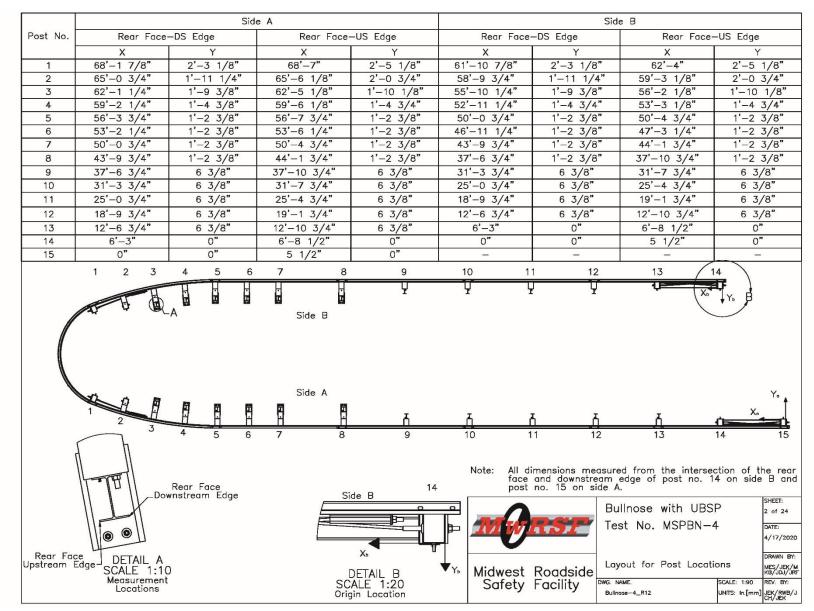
Layout for Post Locations, Test No. MSPBN-4
